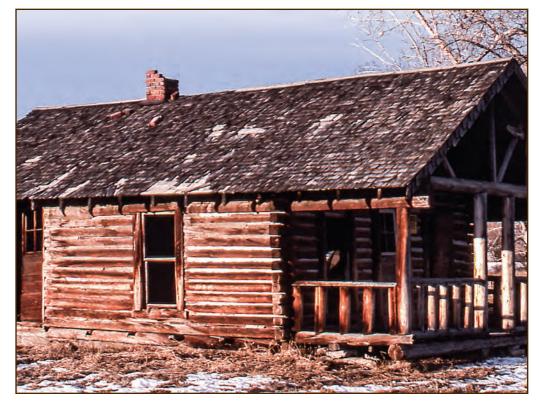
Roofers used boards to construct the ridge cap on this log cabin with a shingle roof north of Lander, WY. *Photo* © *Andrew Gulliford; used with permission.
